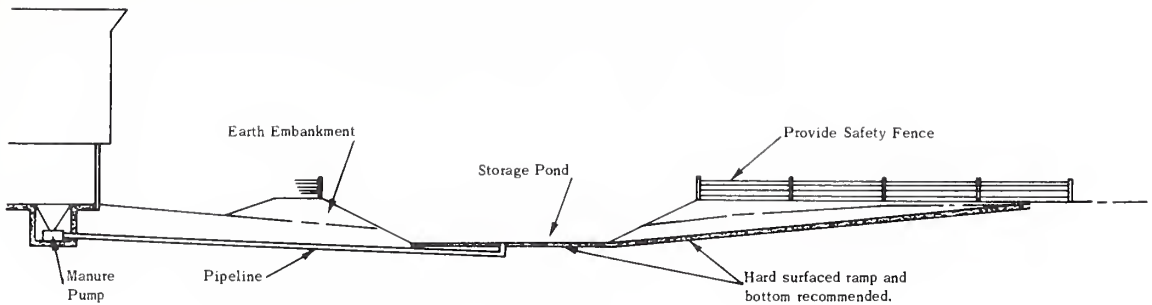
Manure storage pond using manure pump for loading. Capacity should be based on level full condition. Pumping station may facilitate cleanout. Pipe should outlet into or near bottom of pond. Pond should be lower than pump to prevent backflow.
